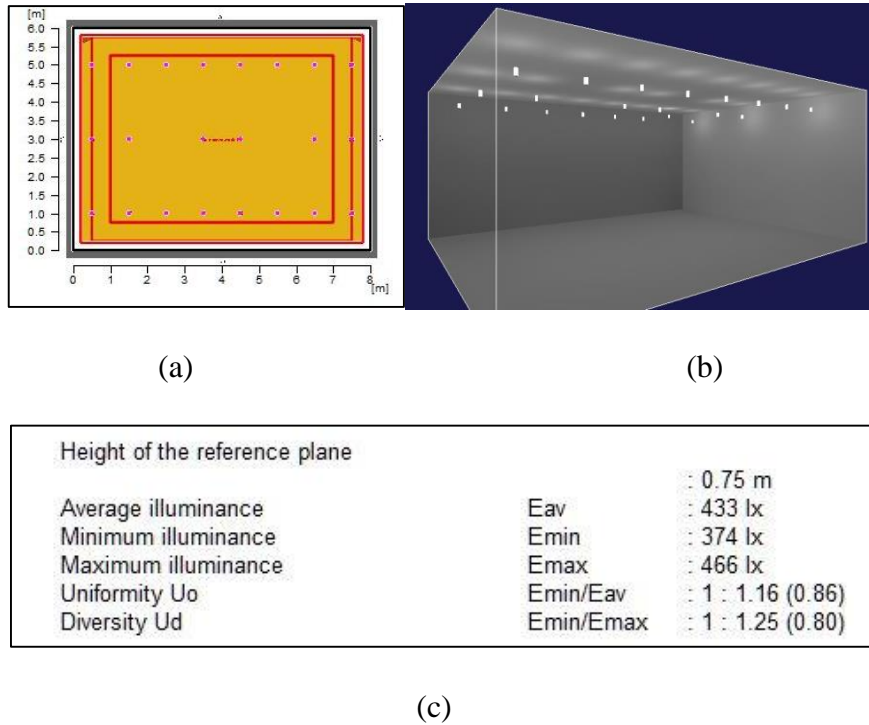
Suggested LED lamps' arrangement in Al-Zahra classrooms, a) Lamps distribution plan, b) 3d view of lamps' arrangement, c) illuminance map above the target plan.
